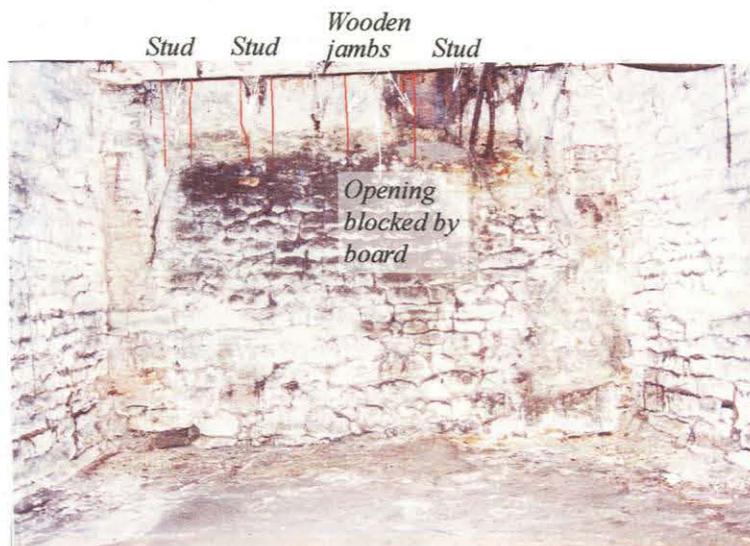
Cellar basement 65/20, no.65, looking eastwards; this wall lies directly below the "shop" window set within the east wall of Room 65/1 on the ground floor above. Note the wooden sill beam which supports a series of wooden studs and plastered over reed infill panels, and also the blocked opening.
